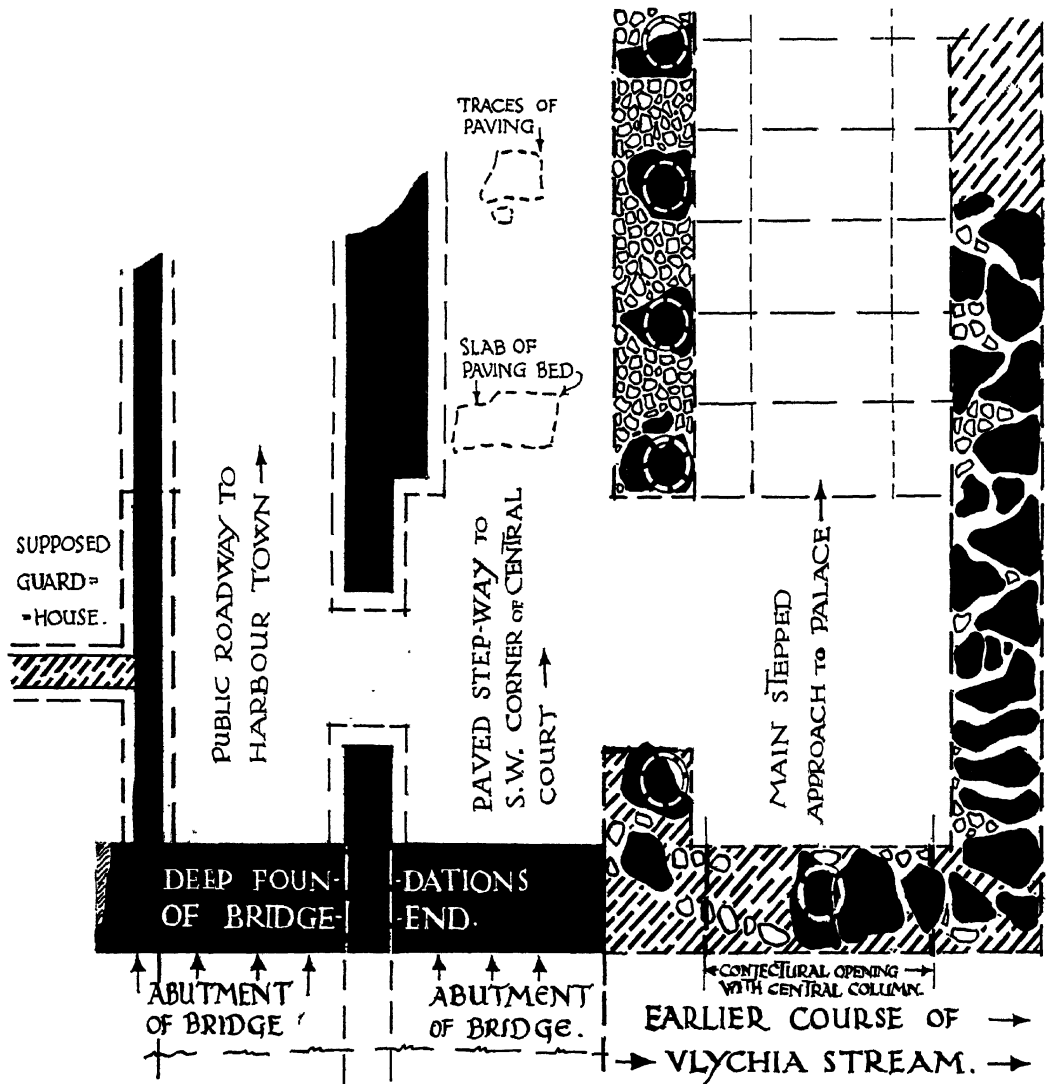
PLAN SHOWING BRIDGE-HEAD AND INITIAL COURSE OF ROADWAYS AND STEPPED PORTICO.
